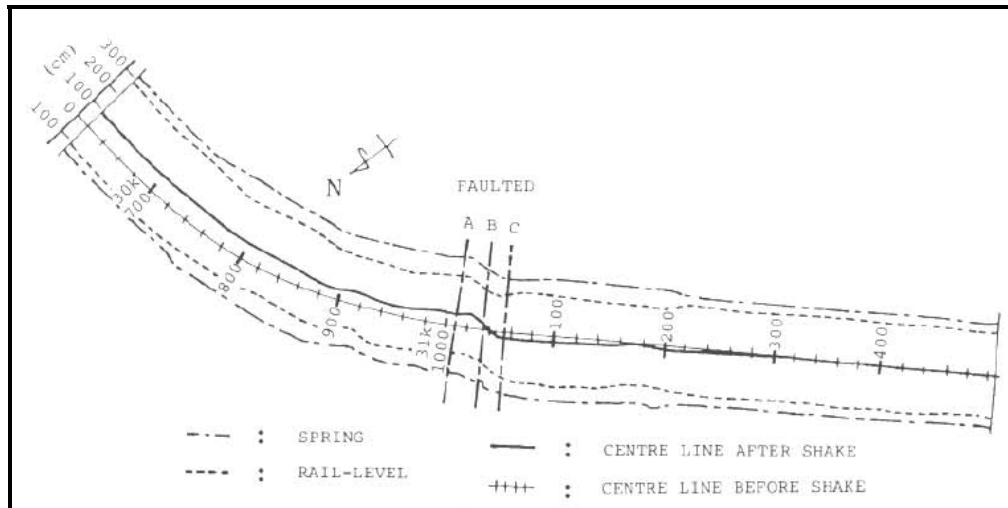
Dislocation and deformation, INATORI tunnel (Yoshikawa and Fukuchi, 1984).
